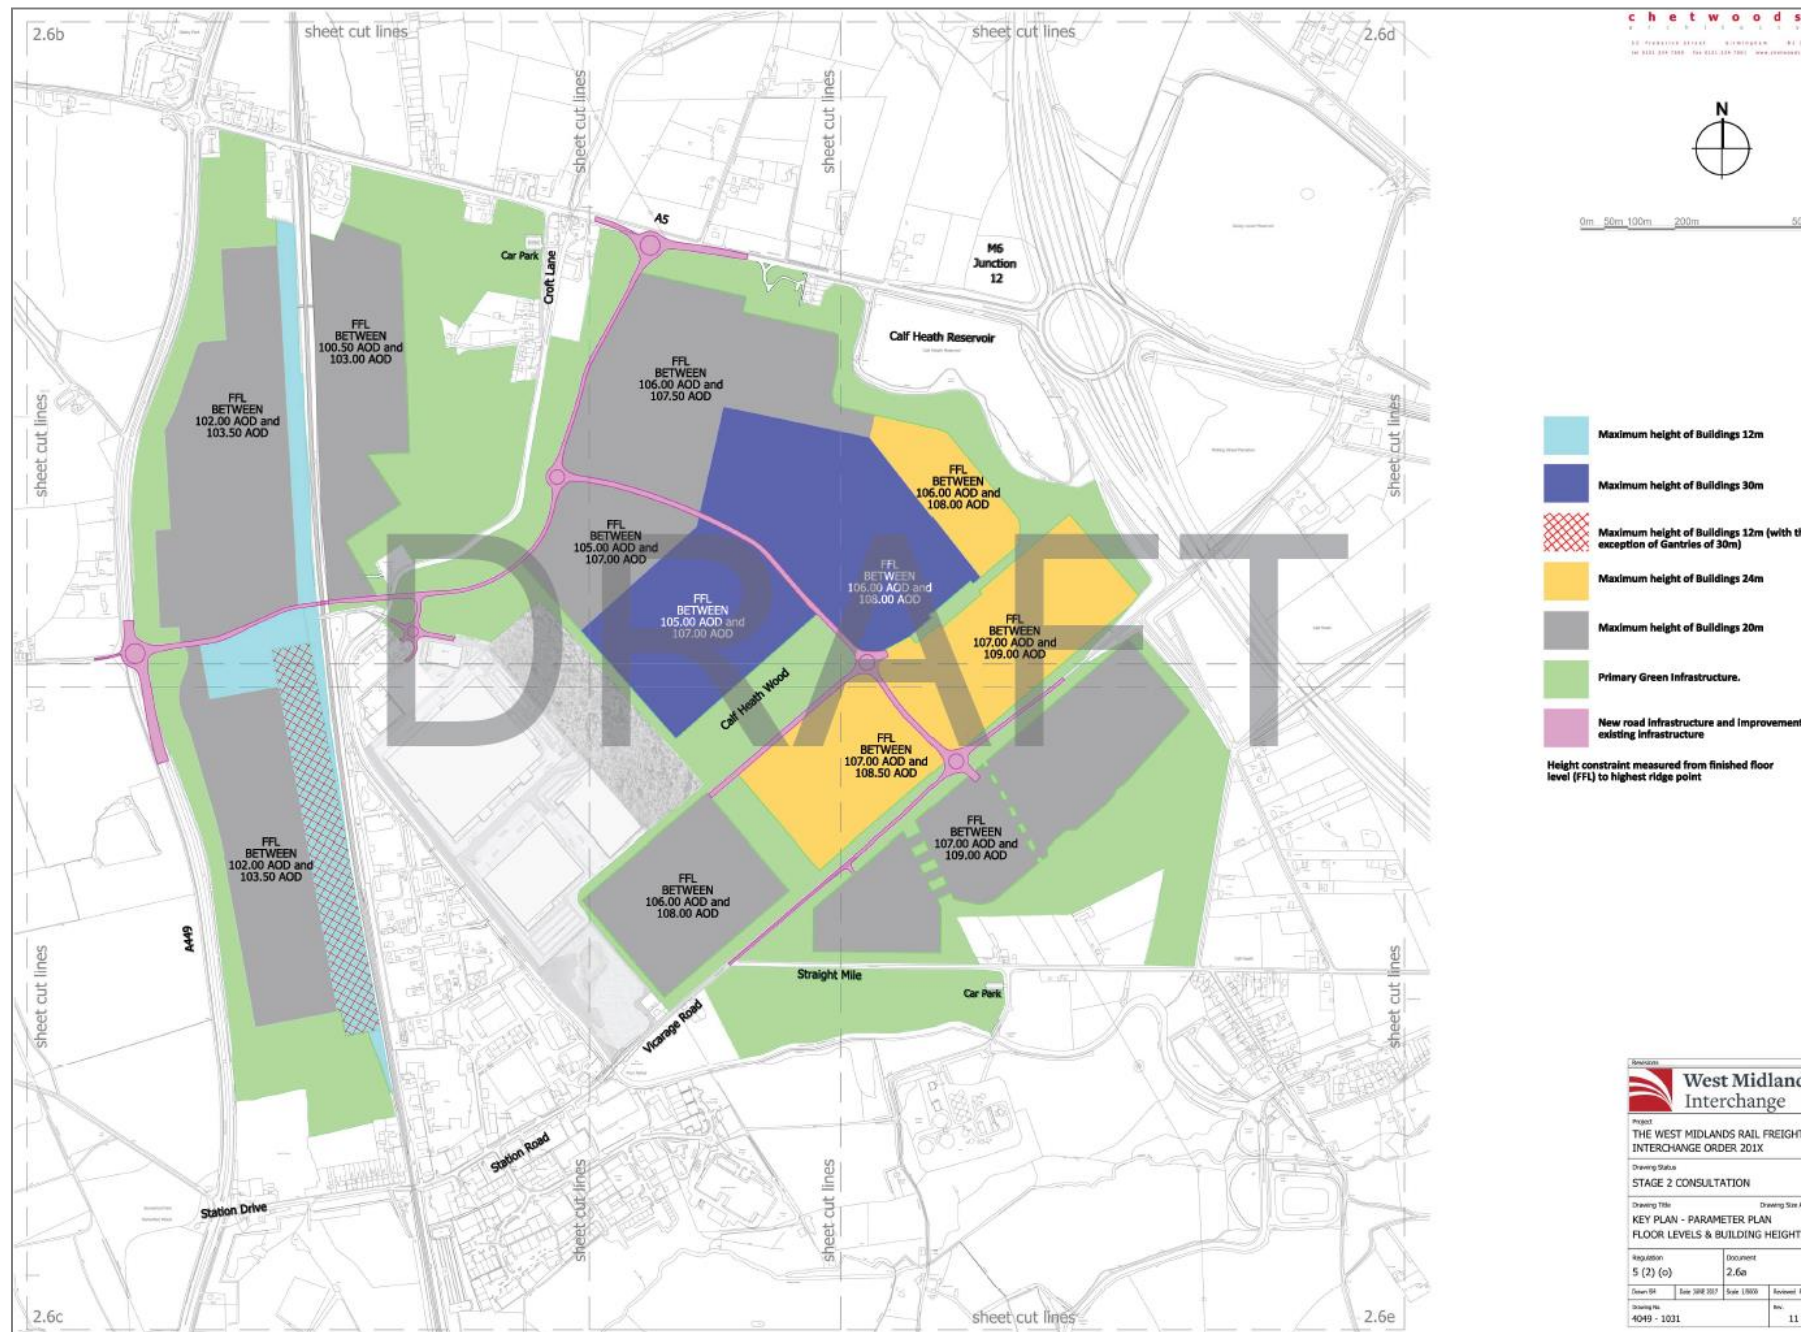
Stage 2 Floor Level and Building Heights Parameter Plan
